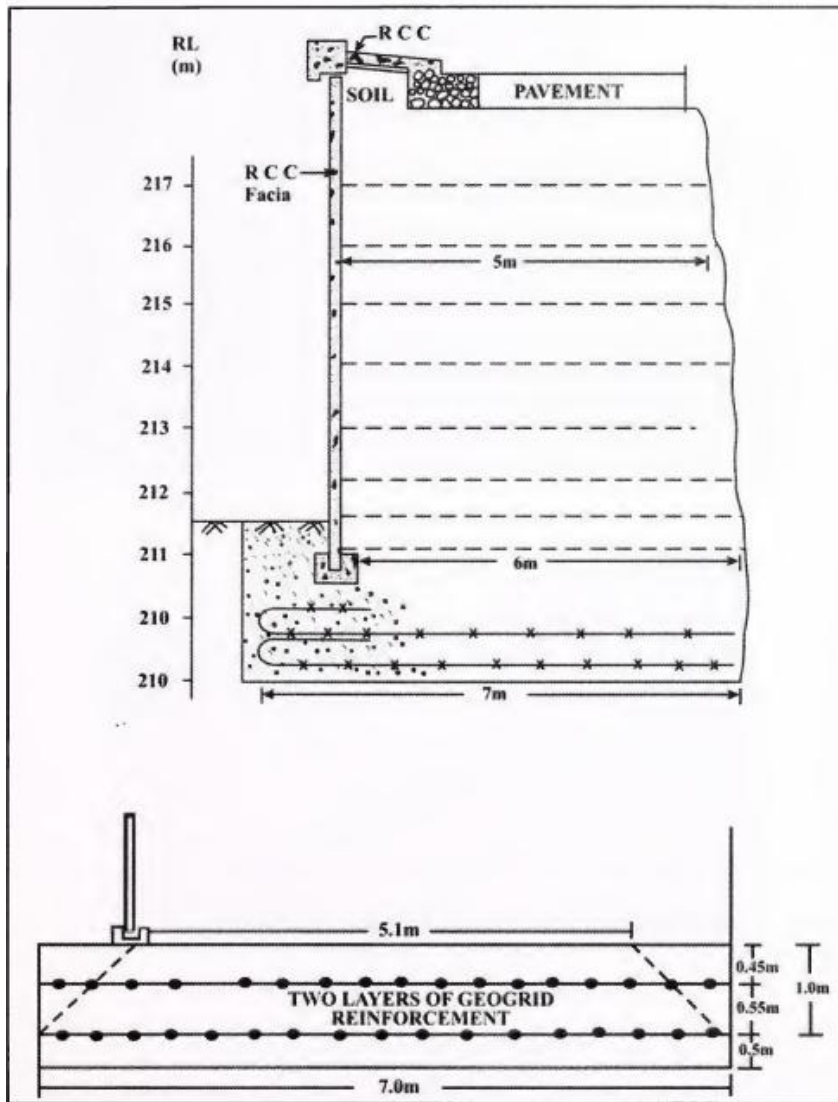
Typical cross-section of the Basal Reinforcement Scheme Provided Under Reinforced Fly Ash Embankment in Okhla [1]
